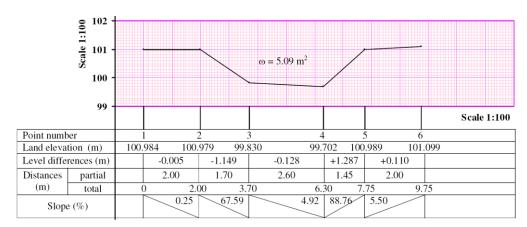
Transversal section through the CC<sub>1</sub> canal, downstream, 100 m from the clogged culvert
